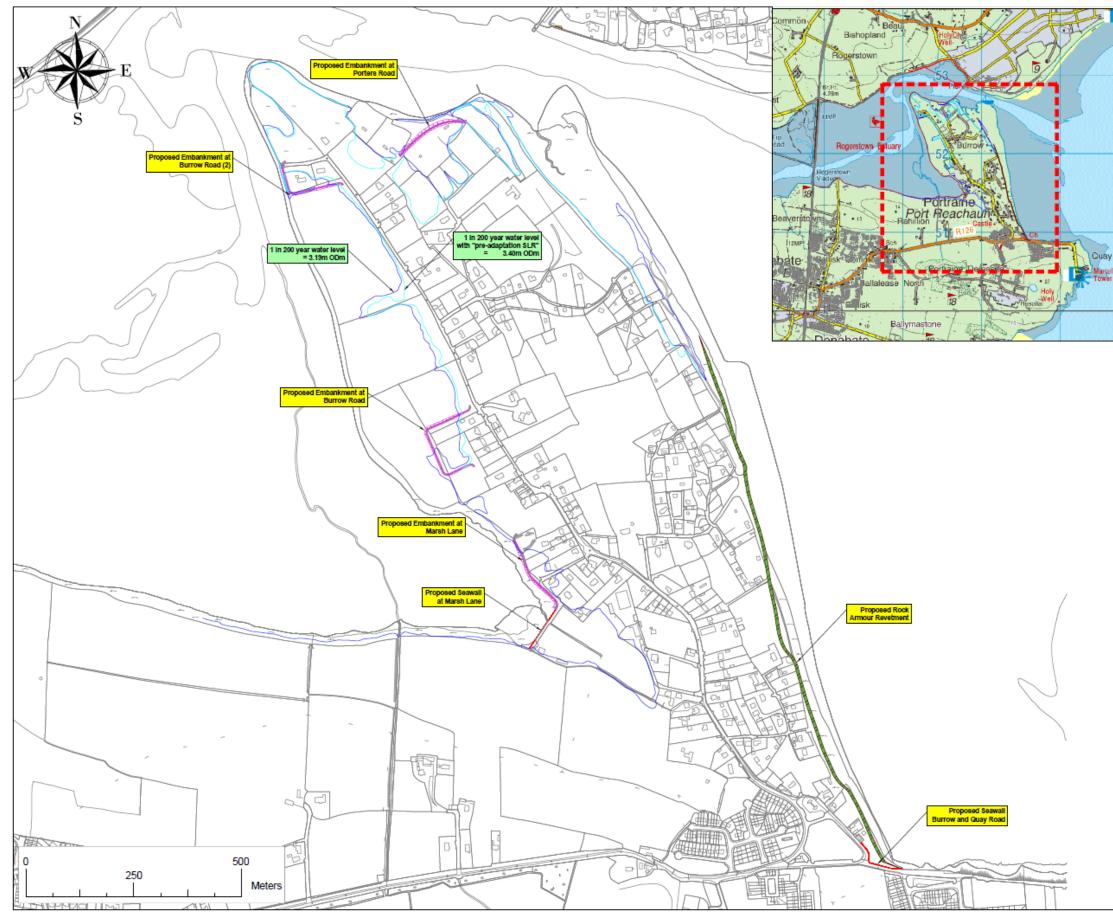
The Burrow Option 1 – Embankments, Seawalls and Rock Revetments Plan View
